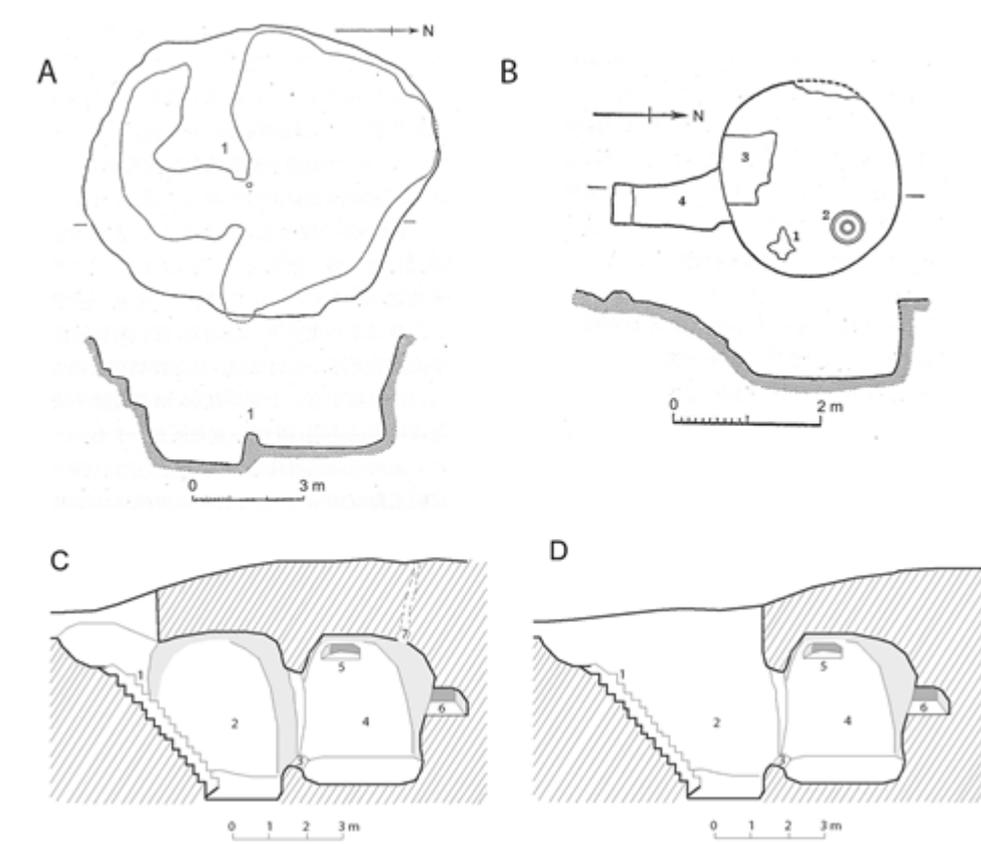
Circular semi-subterranean houses at Zhangjiapo. A: Plan and cross section of house H143, ca. 58 m²; 1 = internal wall. B: Plan and cross section of house H104, 3.15 m²; 1 = hearth; 2 = pottery jar *weng*; 3 = earthen ramp; 4 = entry ramp. C: A tentative reconstruction of a Zhangjiapo cave dwelling with two rooms based on the data of the houses H143 and H104; 1 = stepped entryway; 2 = front room; 3 = internal wall with a passage; 4 = rear room; 5 = storage pit; 6 = stove; 7 = a hypothetical smoke outlet. D: Alternative reconstruction of the same dwelling with a courtyard and one room. 2 = courtyard; 4 = house; other numbers as in C, no smoke outlet. A–B. After: Zhongguo shehui kexueyuan kaogu yanjiusuo, ed., *Fengxi fajue baogao*, Figs. 46–47; C–D. Drawings by the author.
